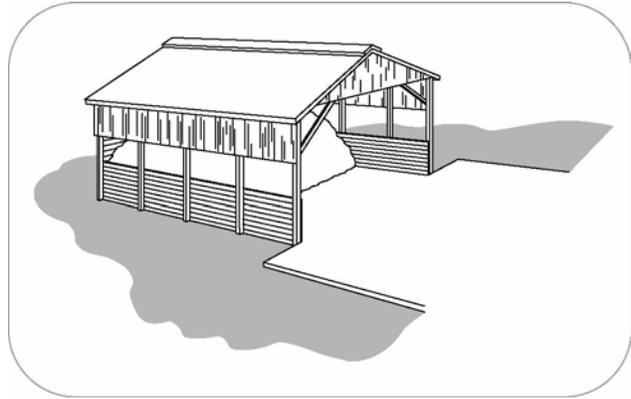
This *Canada Plan Service (CPS-10383)* manure storage (available at www.cps.gov.on.ca) requires a building permit since it has important structural requirements.
